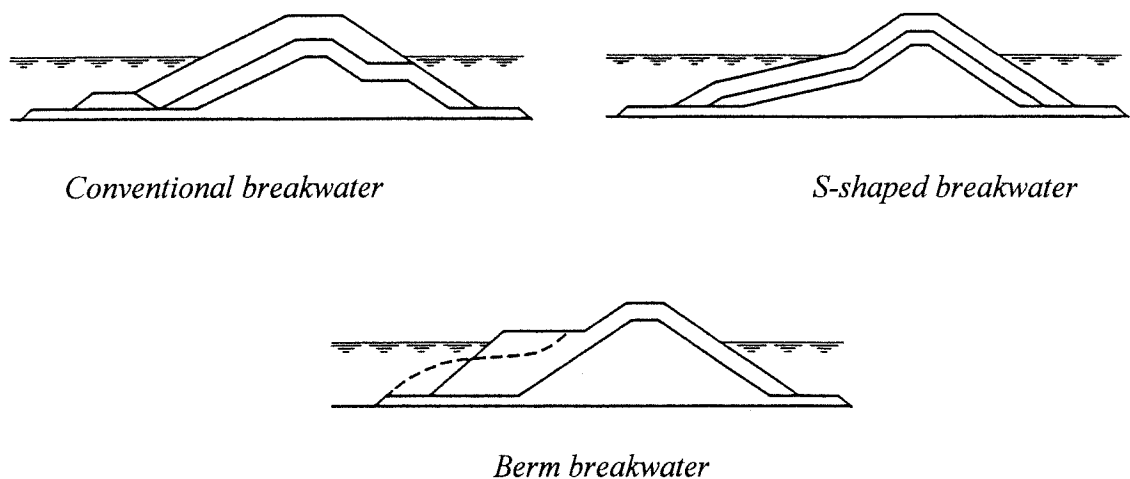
Typical cross-sections of three types of rubble mound breakwaters.
